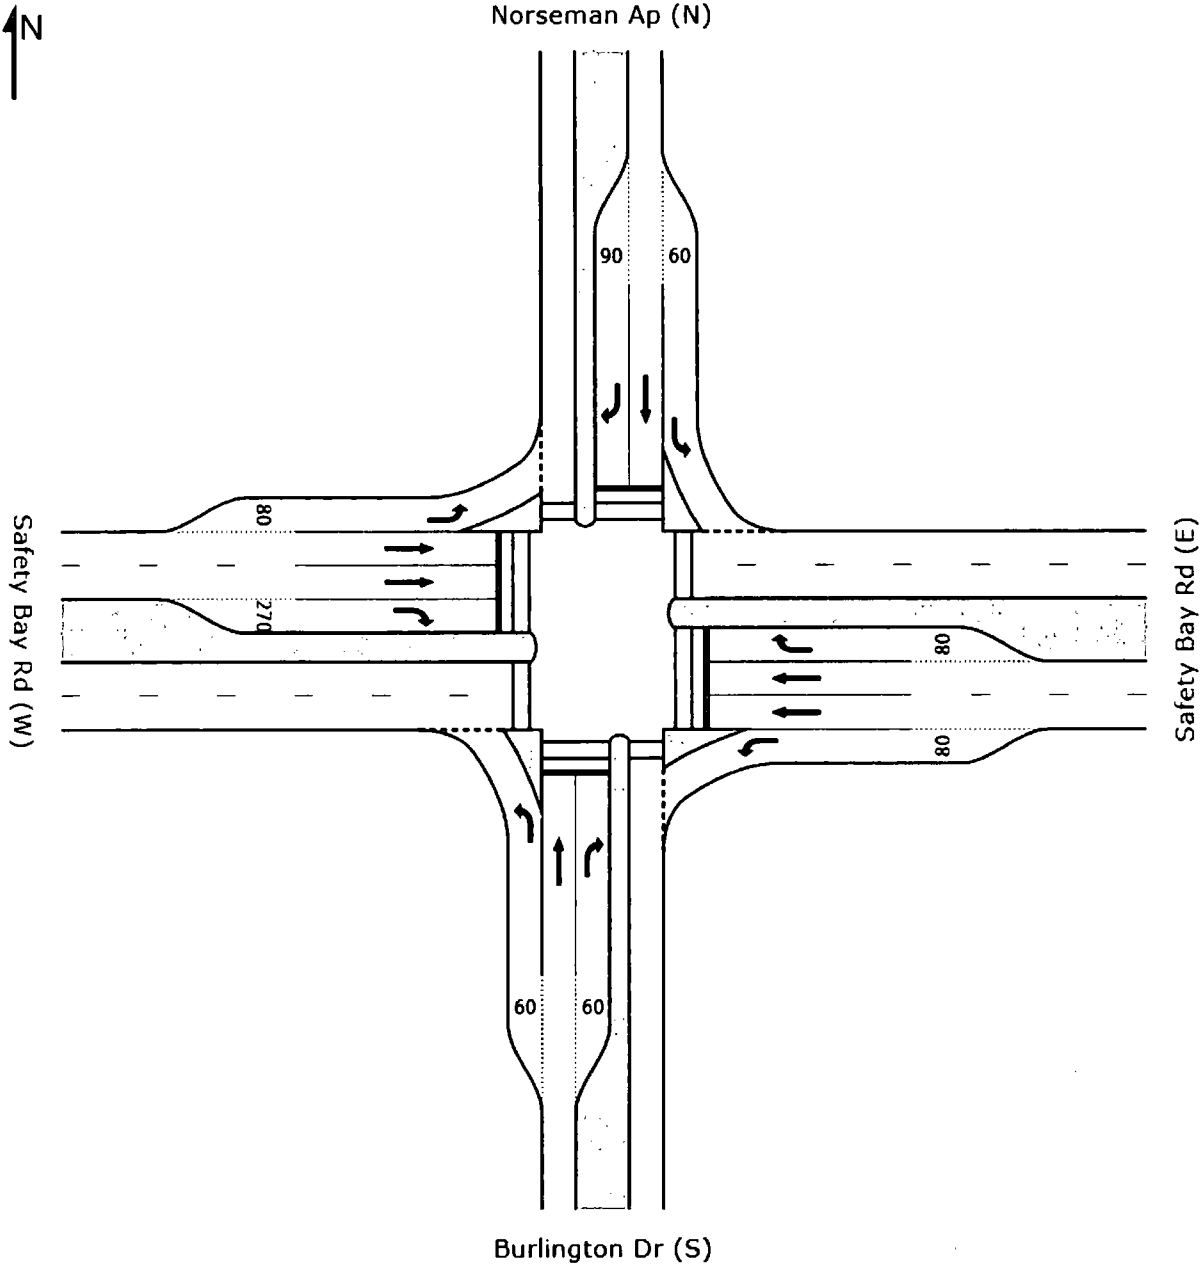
Safety Bay Road / Norseman Approach (4-way) intersection layout
